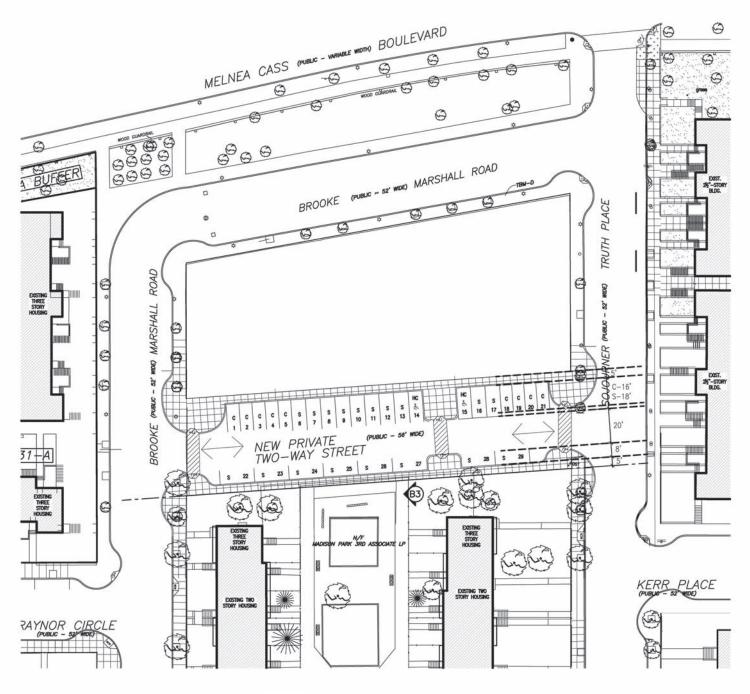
SITE 2B WITH NEW PRIVATE STREET & CURRENT BROOKE MARSHALL RD
